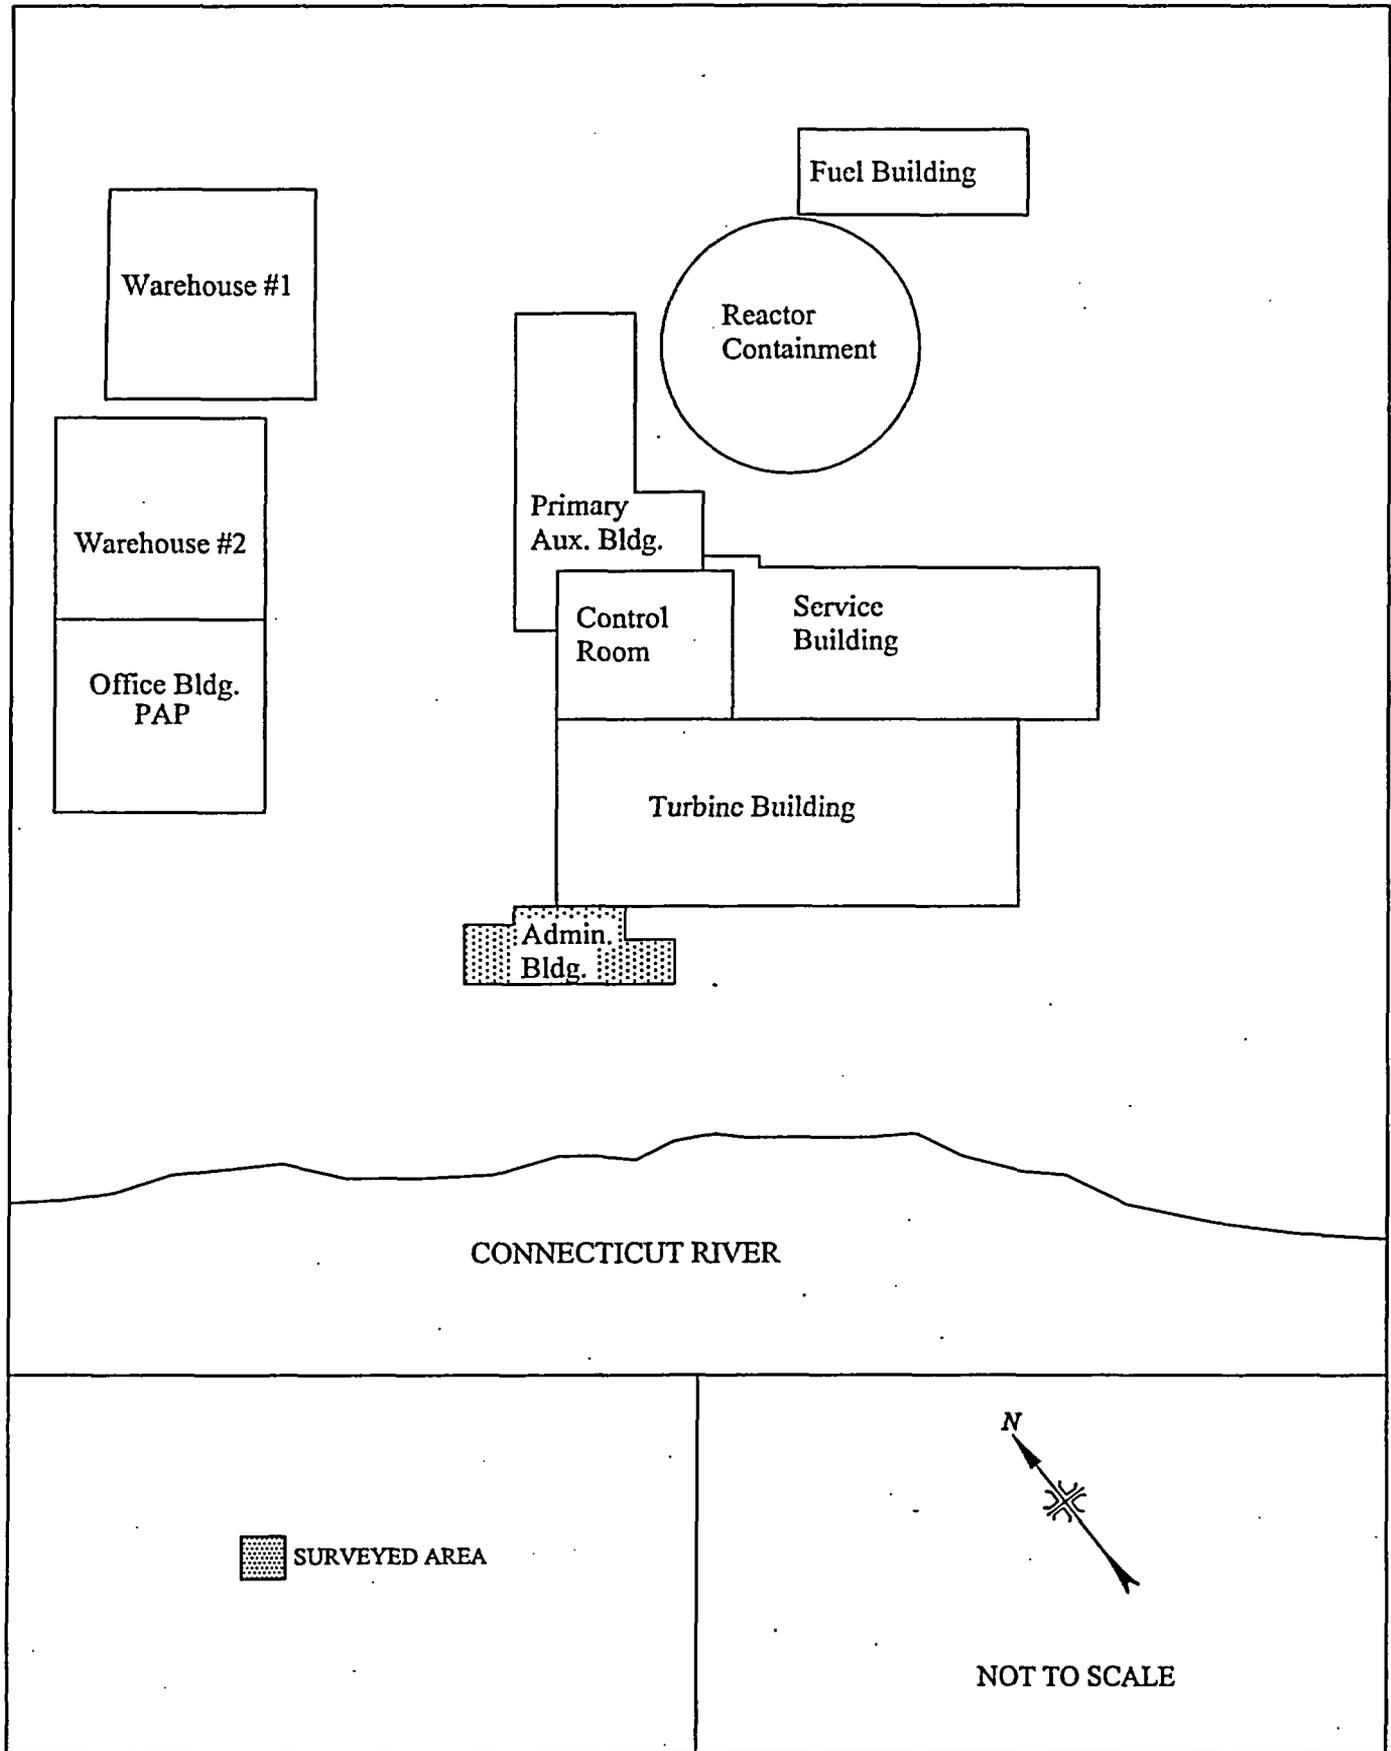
Plot Plan of Buildings at the Connecticut Yankee Haddam Neck Plant
